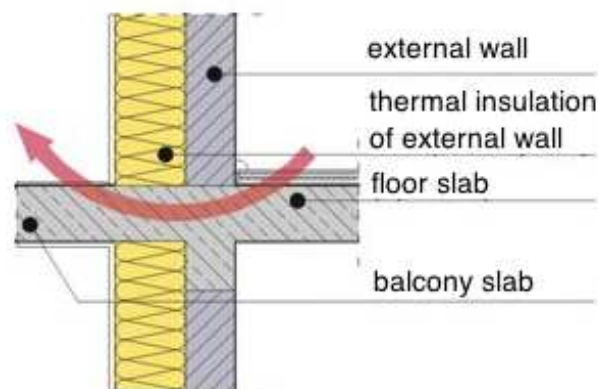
Scheme showing the escape of heat through the cantilever balcony slab. This solution is often used in conventional buildings. [37]
